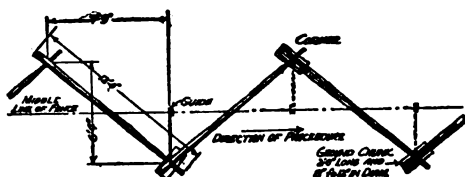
Diagram of a section of rail fence to show distances, construction, use of guide, etc.
